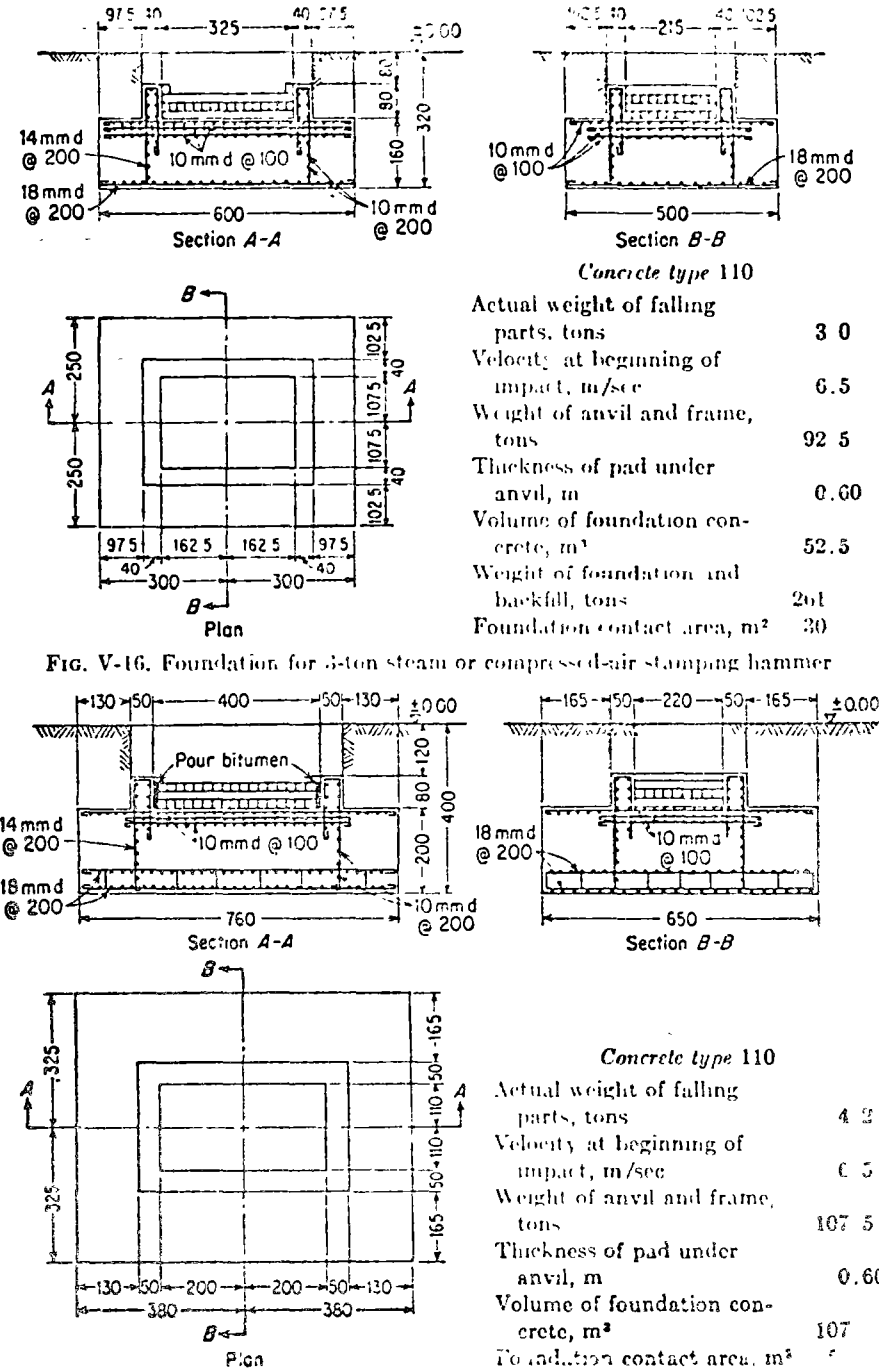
Foundation for 3-ton steam or compressed-air stamping hammer.
